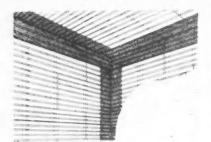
A 12-Inch Strip of Metal Lath Bent Into the Inside Corners of Walls and Ceilings Reinforces the Plastering Even When Applied Over an Ordinary Base.
